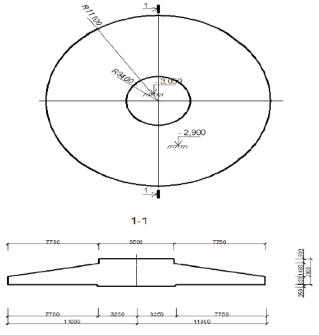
Dimensions and cross-section of typical foundation slab. (Zhussupbekovet al., 2016)
